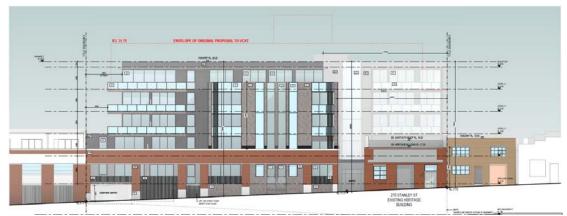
Stanley Street Elevation Red line showing extent of refused building envelop (Source: Point Architects Pty Ltd)
